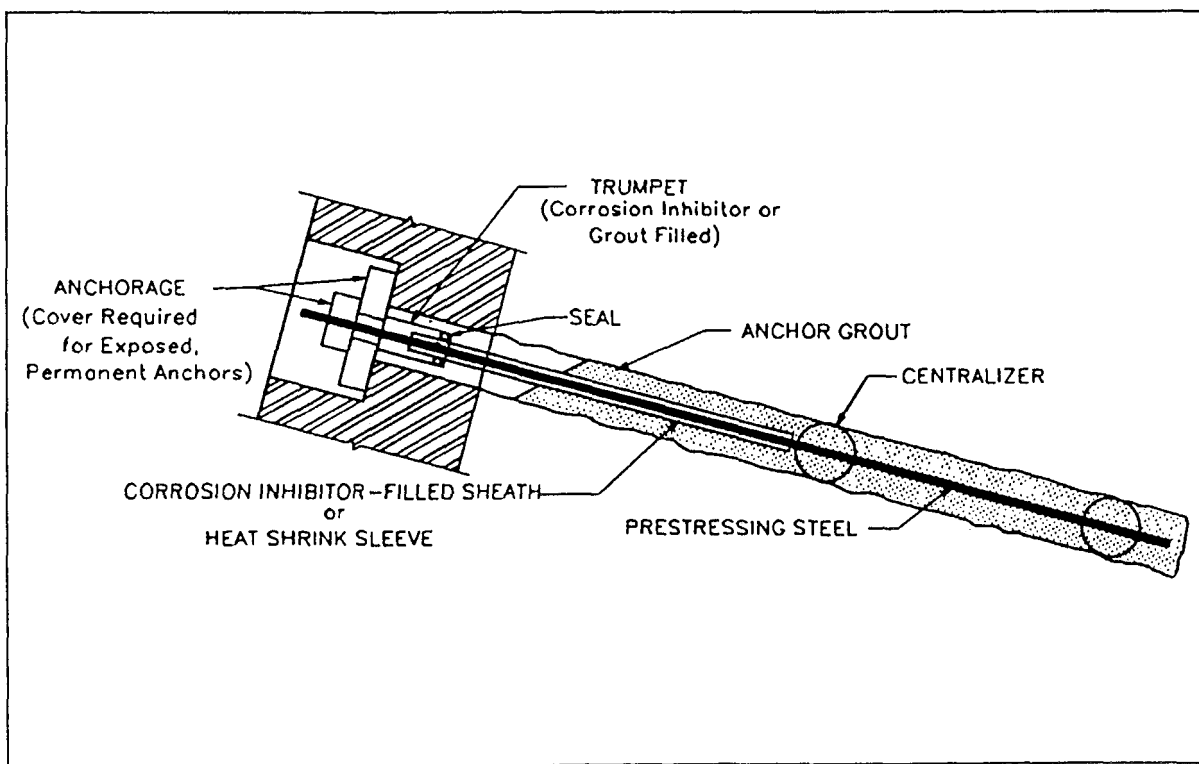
Class II Protection - Grout Protected Anchor (PTI, 1996).
